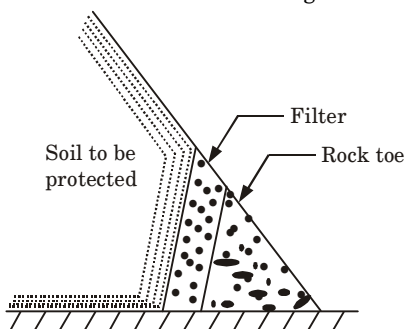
Use of filter at the toe of an earth dam.
